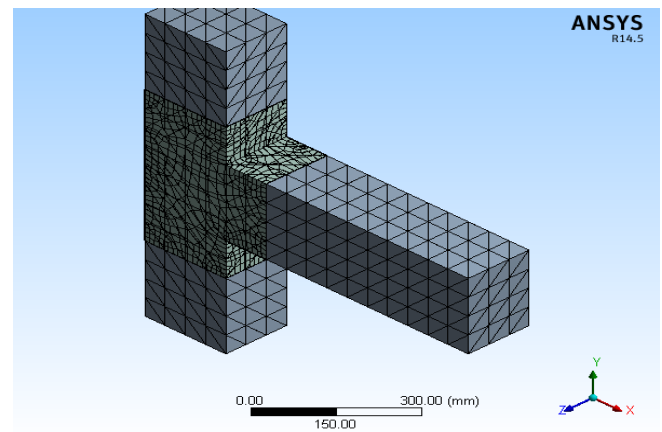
Mesh model for exterior beam column joint with cfrp wrapping
